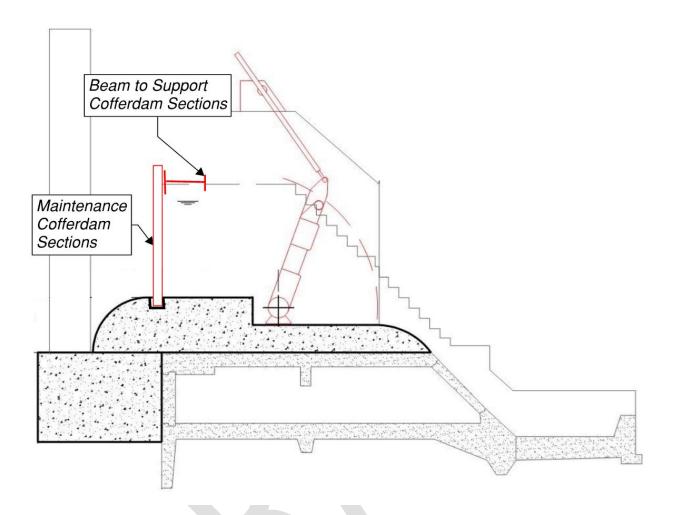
Conceptual Arrangement of Beam with Vertically Spanning Panels
